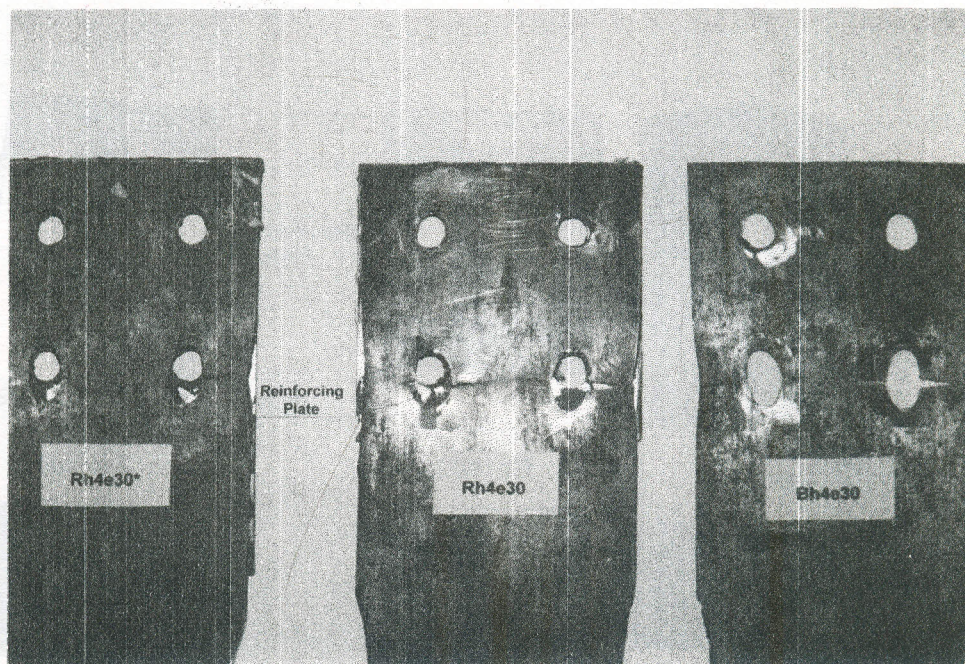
Failure of bolted and reinforced joints with 4 bolts.
